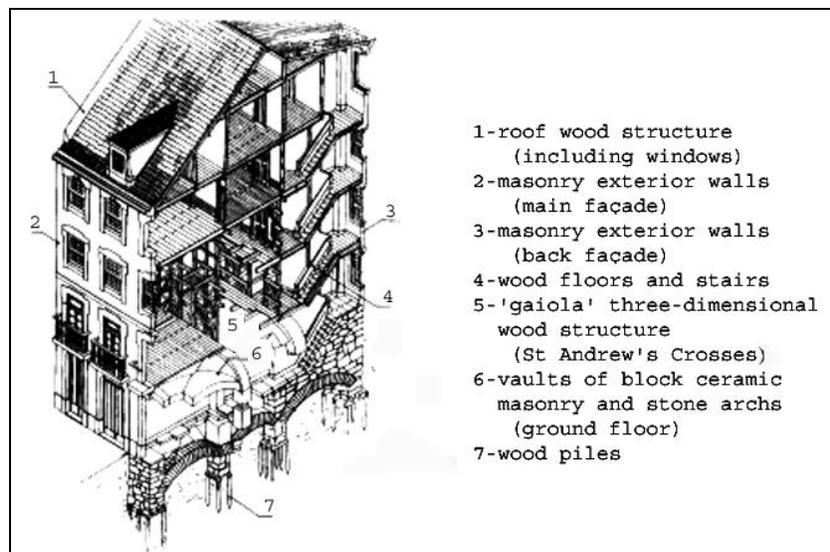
Structural details of a ‘Pombalino’ Building (*adapted from Mascarenhas [2]*)
